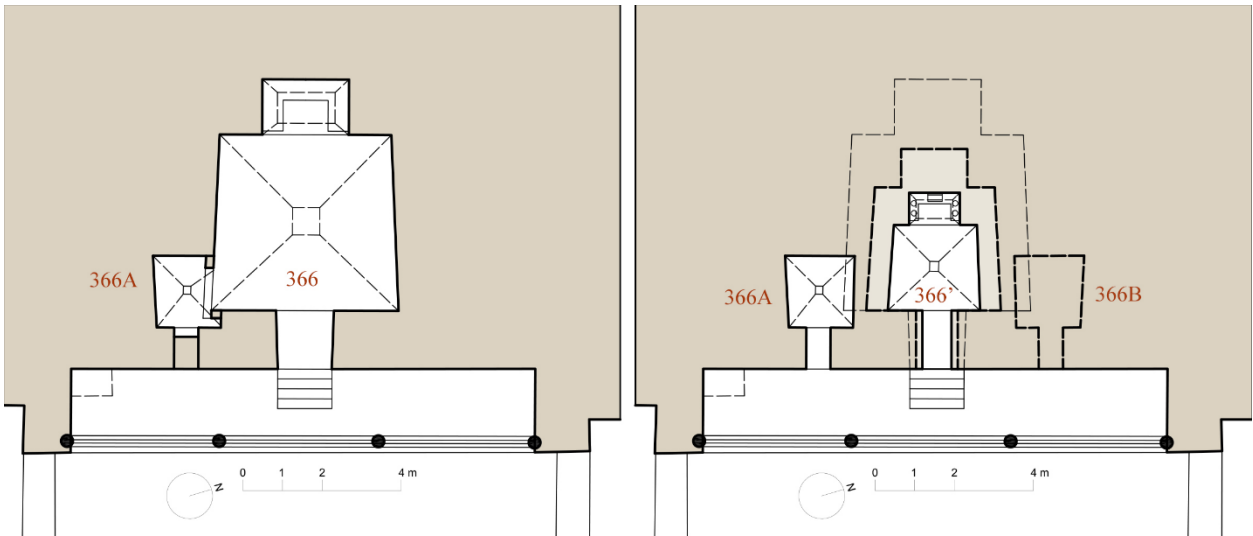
Plan drawings of the top-level caves of the Pavilion. a) the current status; b) author's reconstruction of the initial design of a cave triad that were later modified into Caves 366 and 366A showing the reconstructed design in thick dashed lines. Drawing by author.
